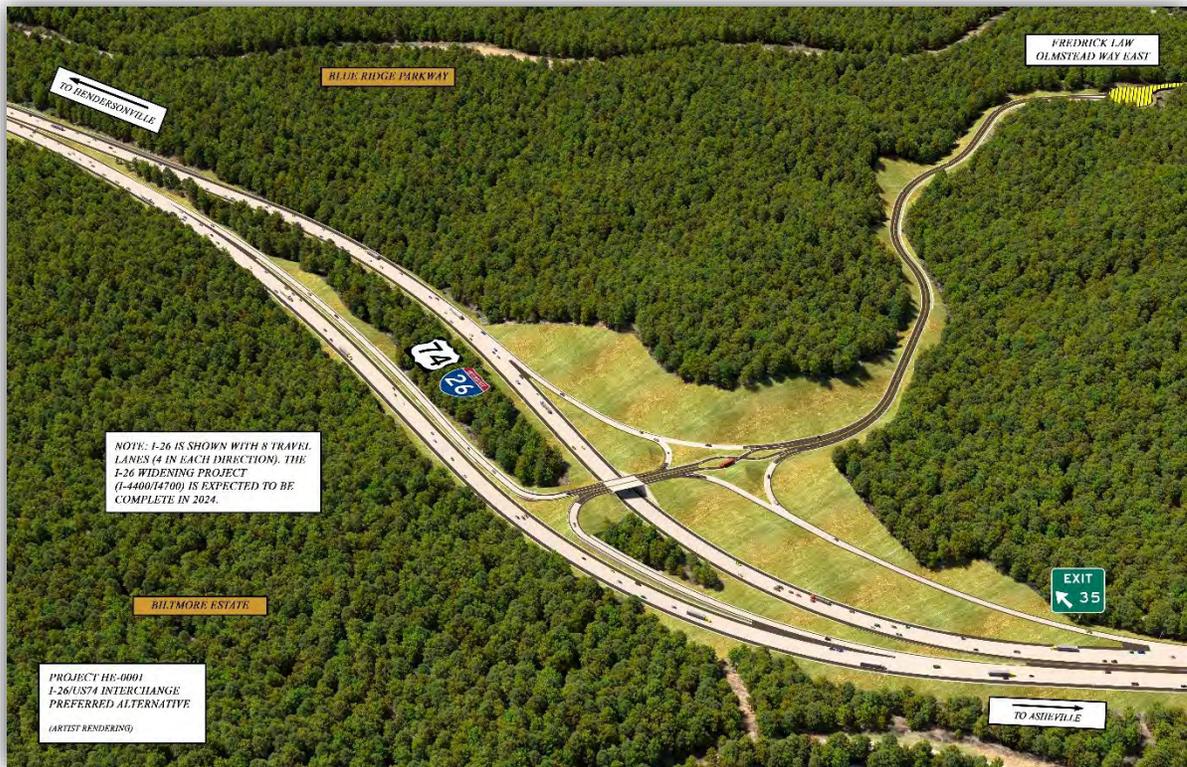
Birdseye view to the southeast (artist rendering). Note extent of concrete sidewalk on East Frederick Law Olmsted Way.
